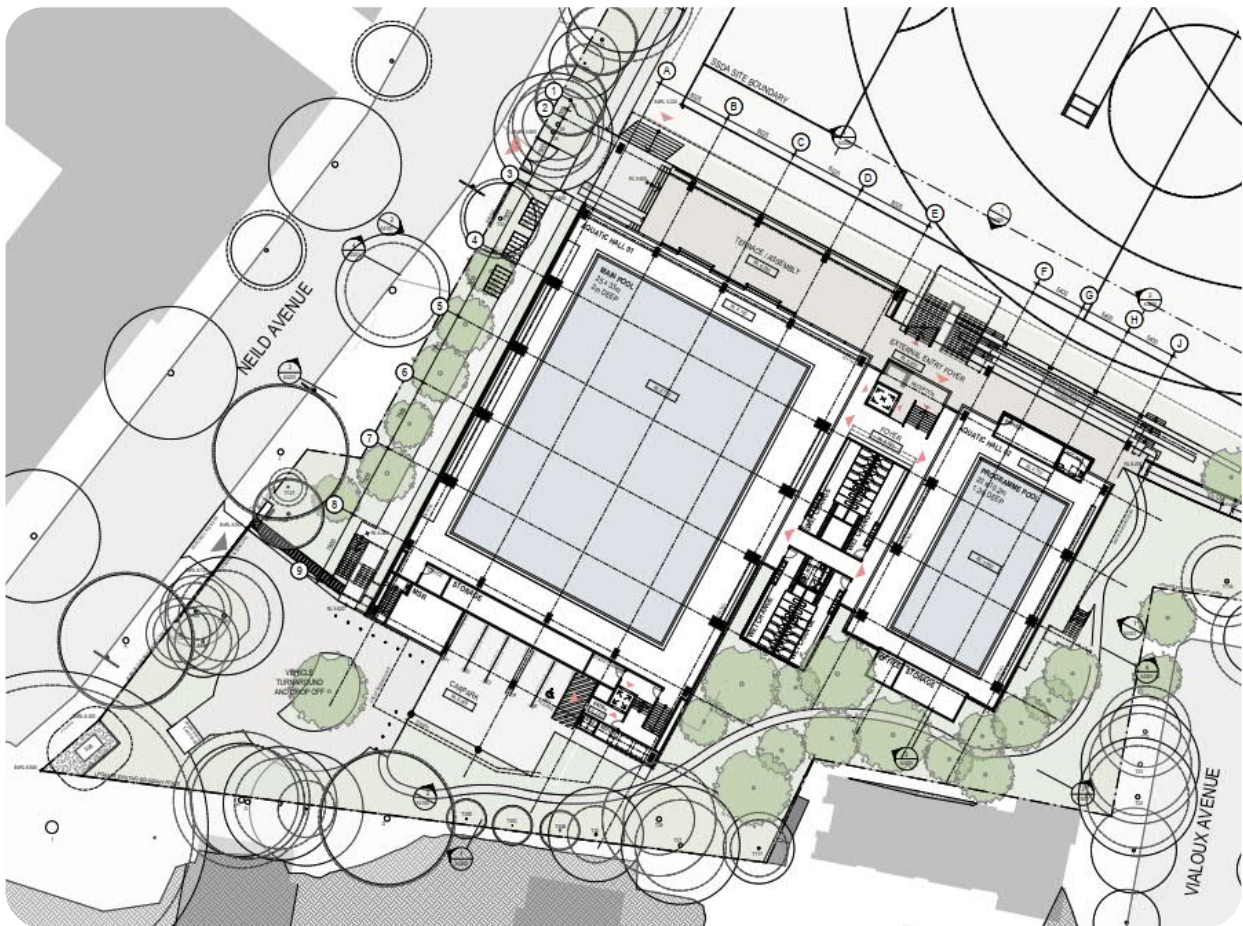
Building 1 - Ground Floor General Arrangement - Alan Jack and Cottier Architects
